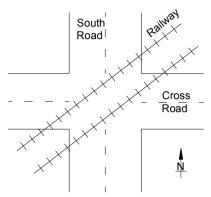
Layout of Emerson Crossing before the construction of the overpass (Not to scale)
